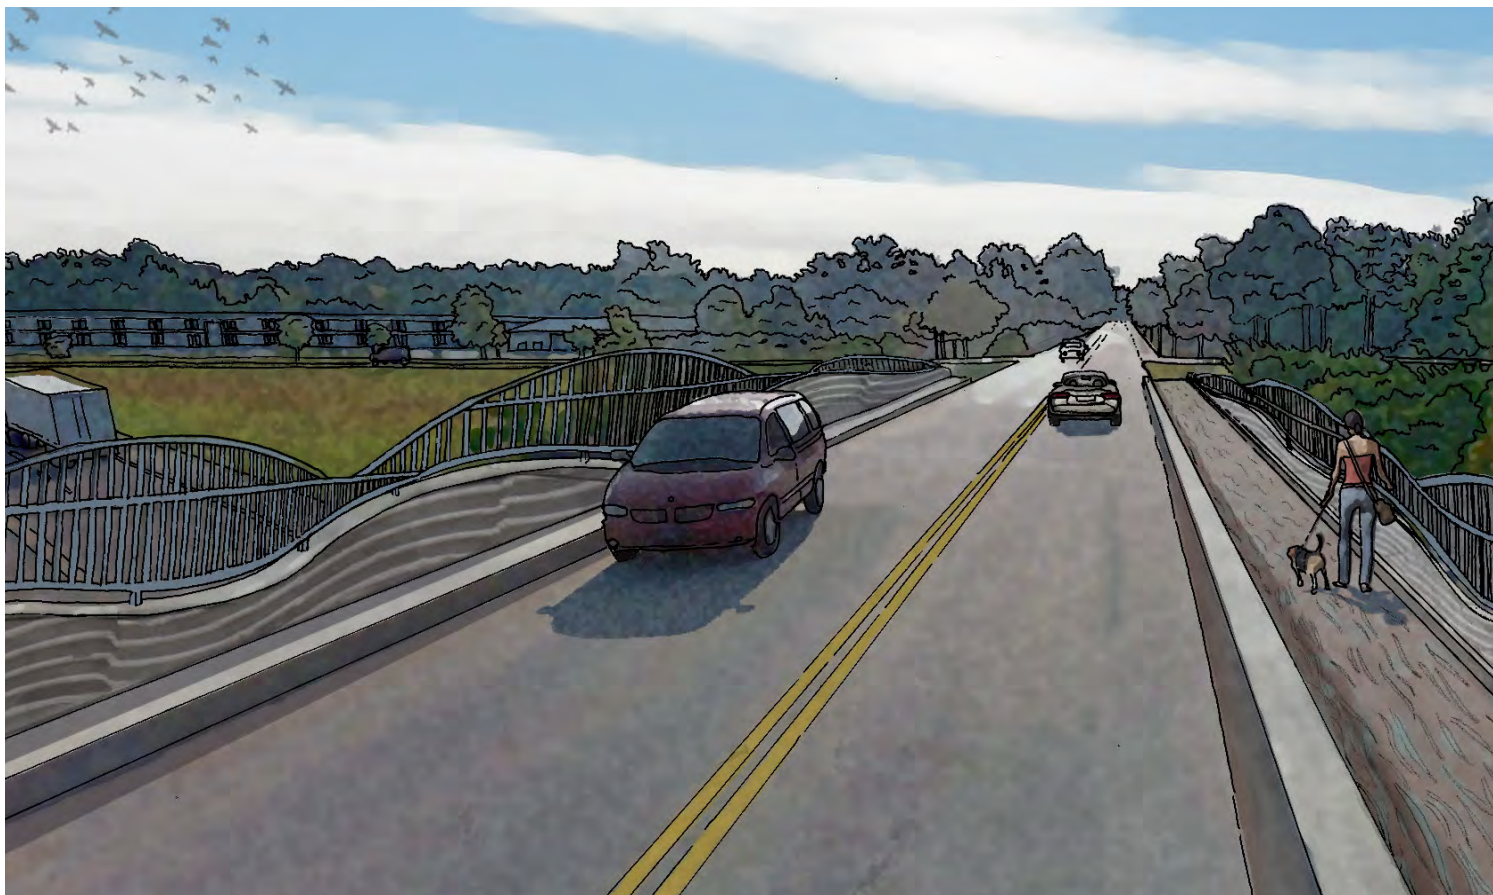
Conceptual illustration on the overpass heading east shows the updated railing, custom concrete patterns on the bridge and pavement evoking the Lumber River.
